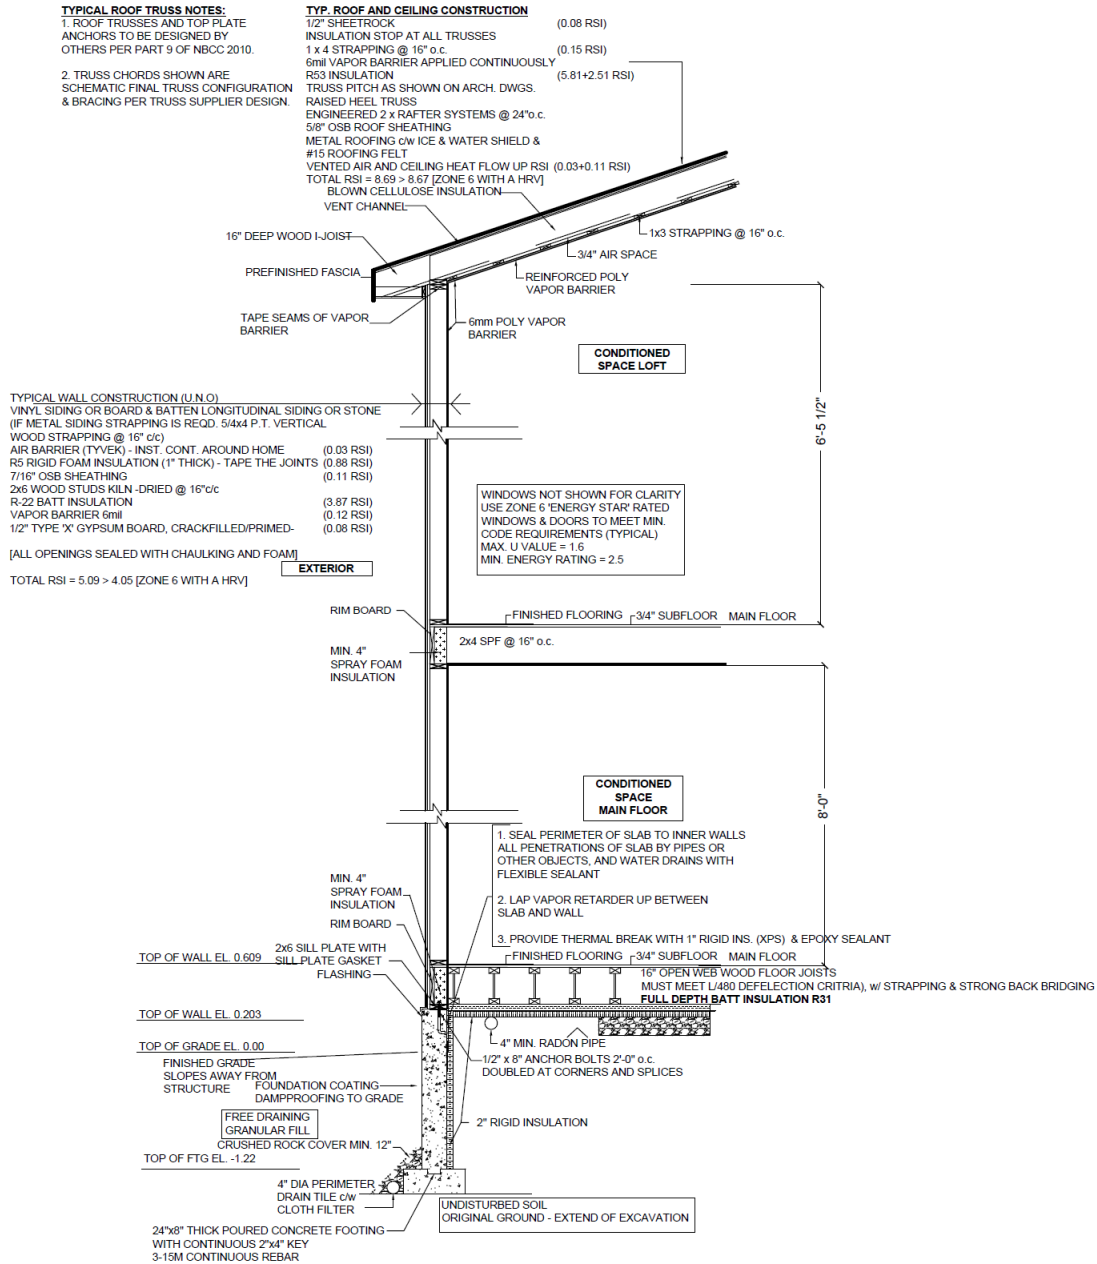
Section of the Wooden Tiny House under Loft (adopted from Noory Engineering Inc, 2023)
